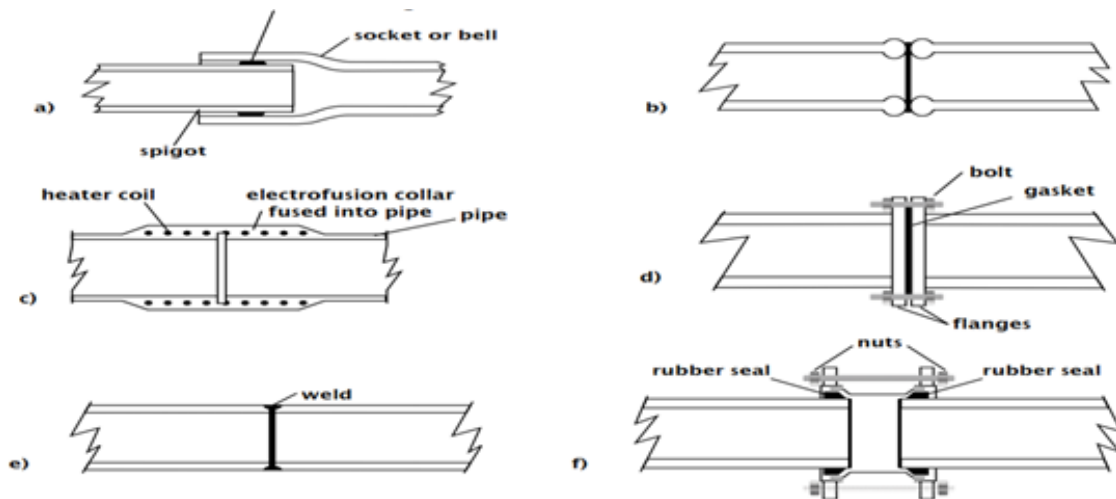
Common types of pipe joints: a) spigot and socket; b) butt welded; c) electro fusion; d) flanged; e) welded; f) mechanical coupling.
